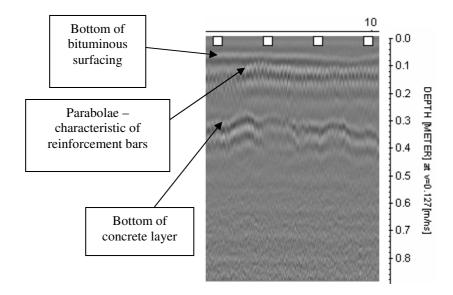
GPR Profile of thin bituminious surface over reinforced concrete slab
